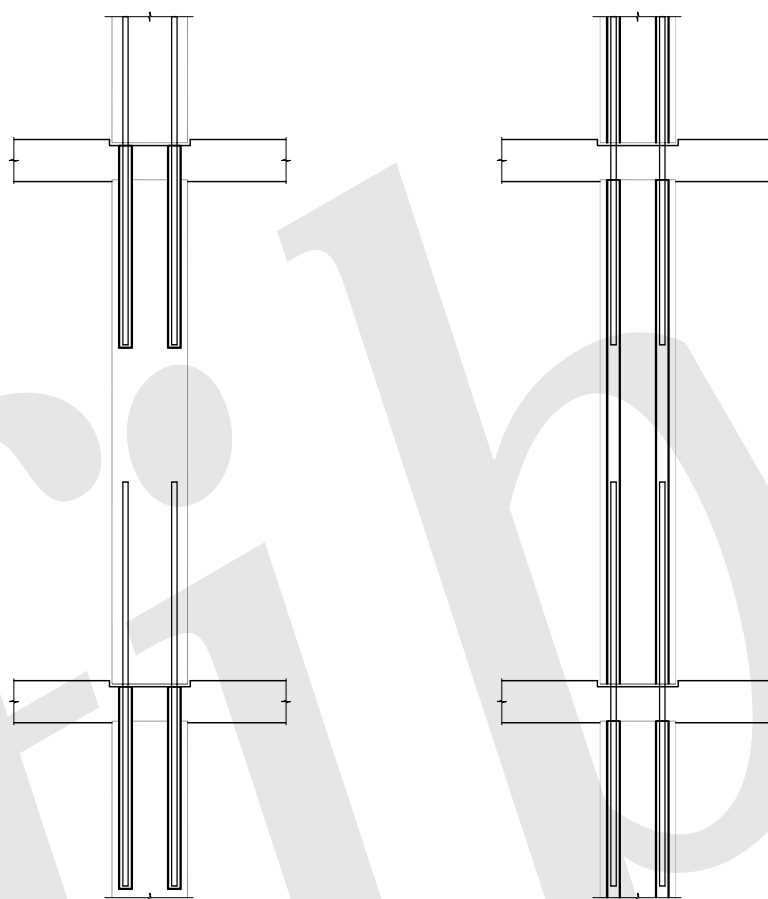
Connection methods using cast in tubes; a) shows tubes cast into the tops of columns, b) has continuous tubes. In both cases the connecting bars lap with the main vertical reinforcement in the precast columns.
